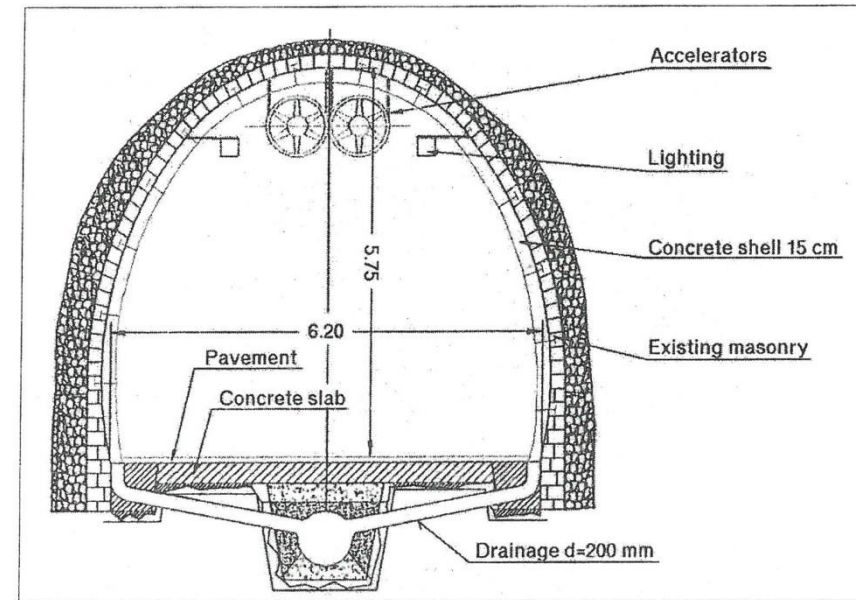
Typical cross-section of Tende Tunnel (reinforced concrete shell was realized between 180 and 380 in 1994-95), [CETu, 1978], [CETu Lyon, 1996].
